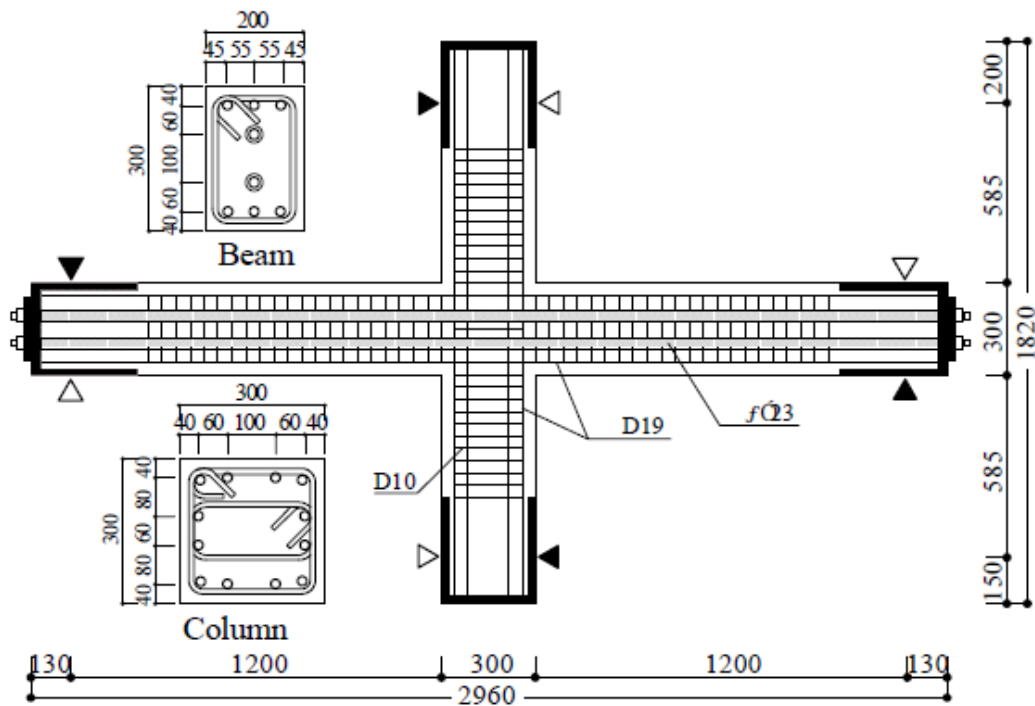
Reinforcement and prestressing detail of the test unit (Reference: *Kashiwazaki and Noguchi, 2000*)
